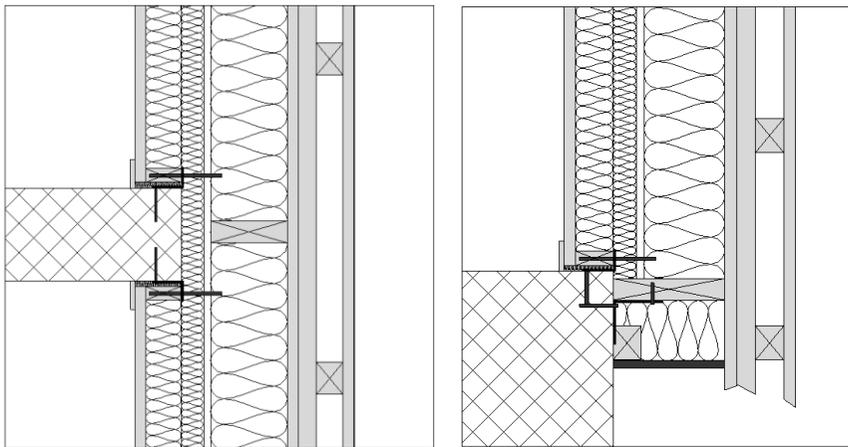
Construction details. To the left: External wall panels and story partition; To the right: External wall panels and foundation, - principle sketches by Aija Baumane, based on Risør Technical College construction drawings (Larsen & NTNU, 2010)
